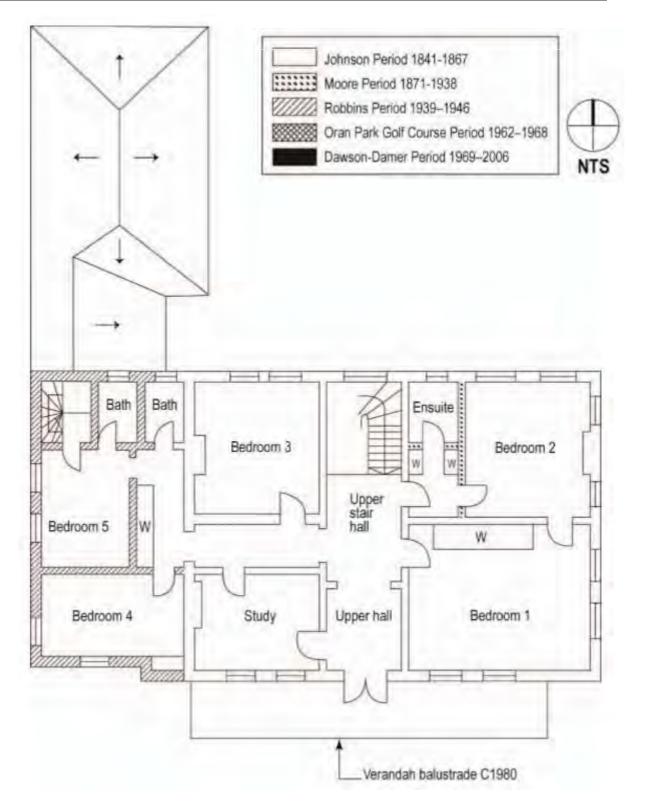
First Floor Sketch Plan not to scale. Source: GML 2010 CMP pg. 59.
